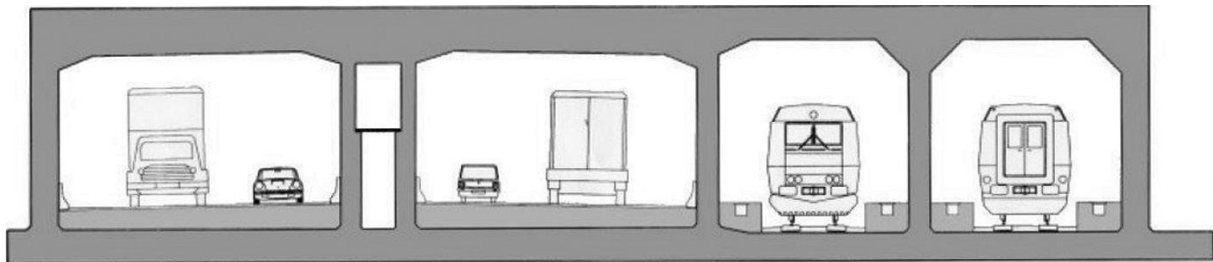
Figure appendix A-3; Concrete tunnel cross-section (Lunniss & Baber, 2013, p. 32)
